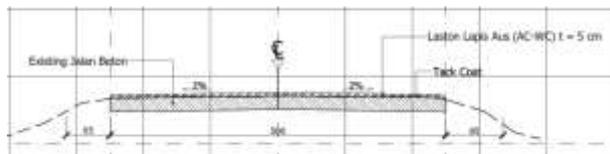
Typical cross-sectional design in STA 0+750 to 1+900 (asphalt overlay)
